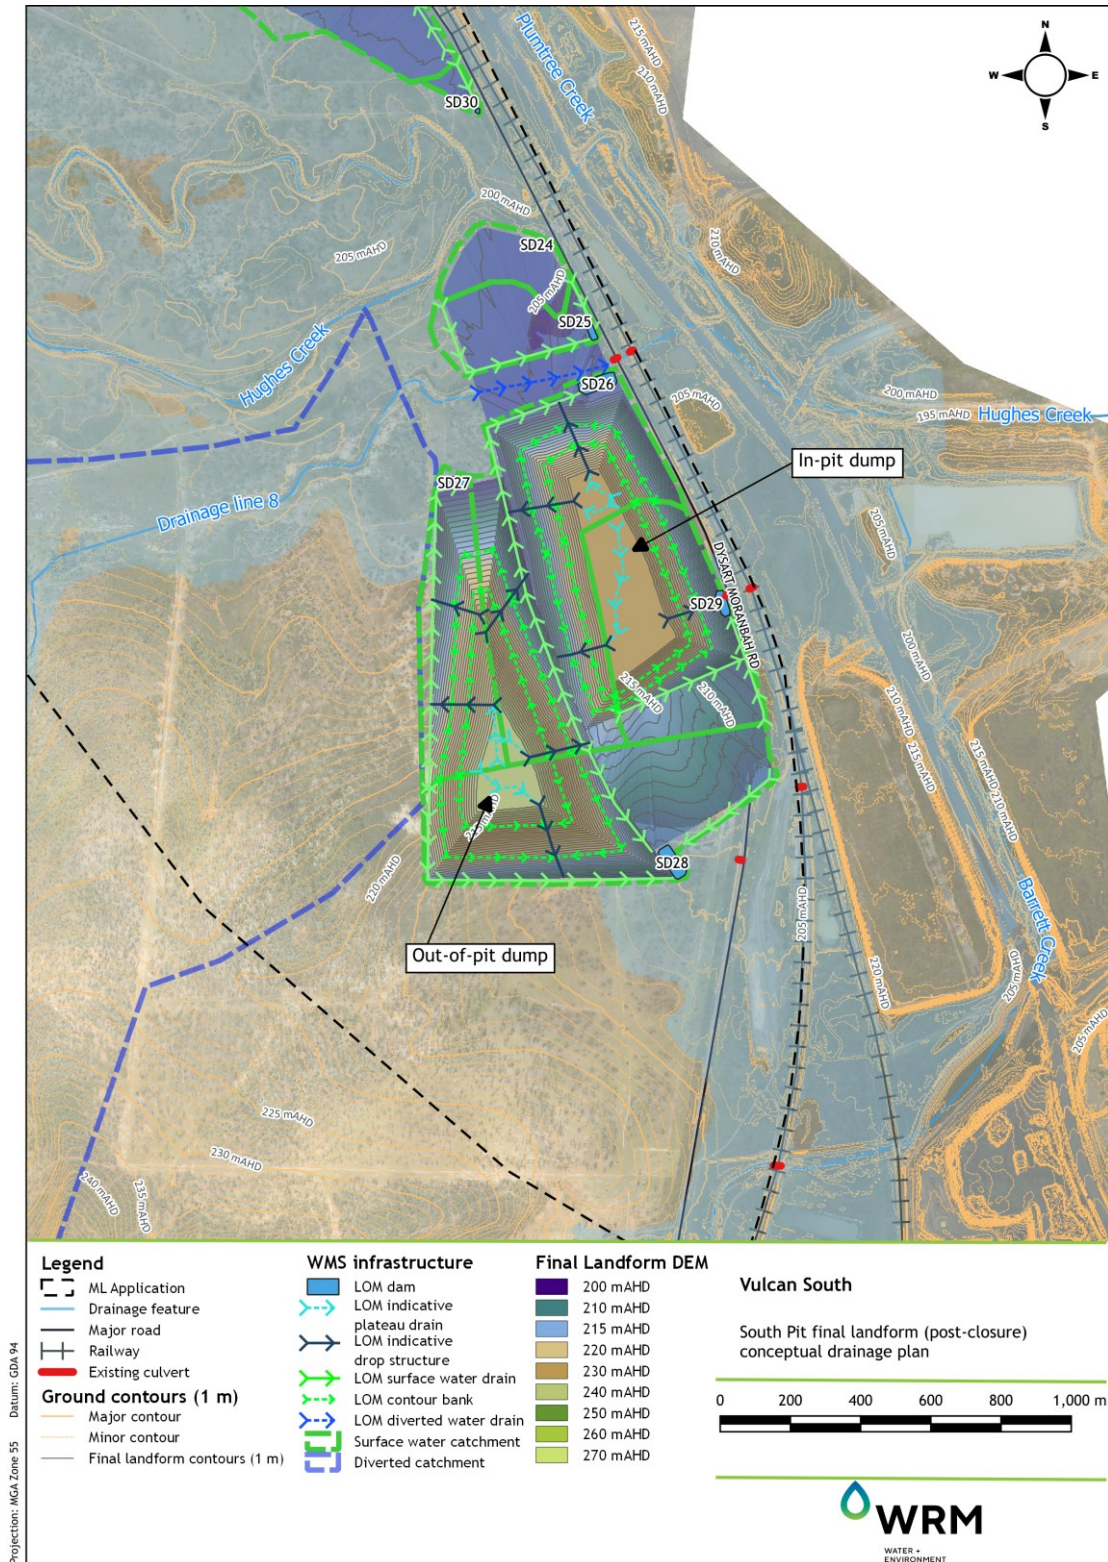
Vulcan South final landform (post-closure) conceptual drainage plan
